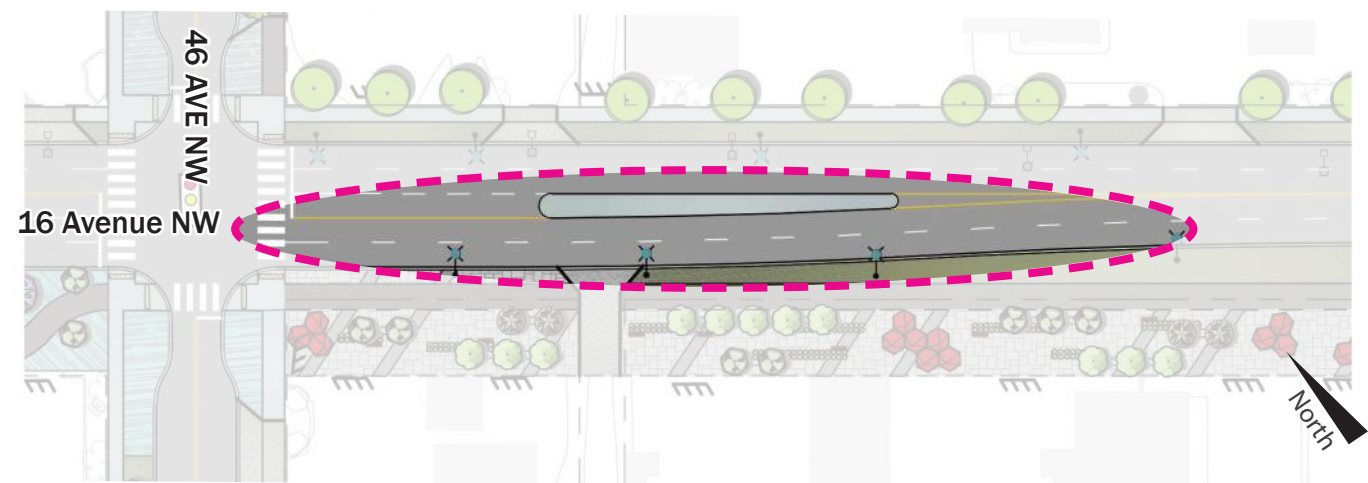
MEDIAN WEST OF 45 STREET NW - POTENTIAL PLACEMAKING LOCATION
